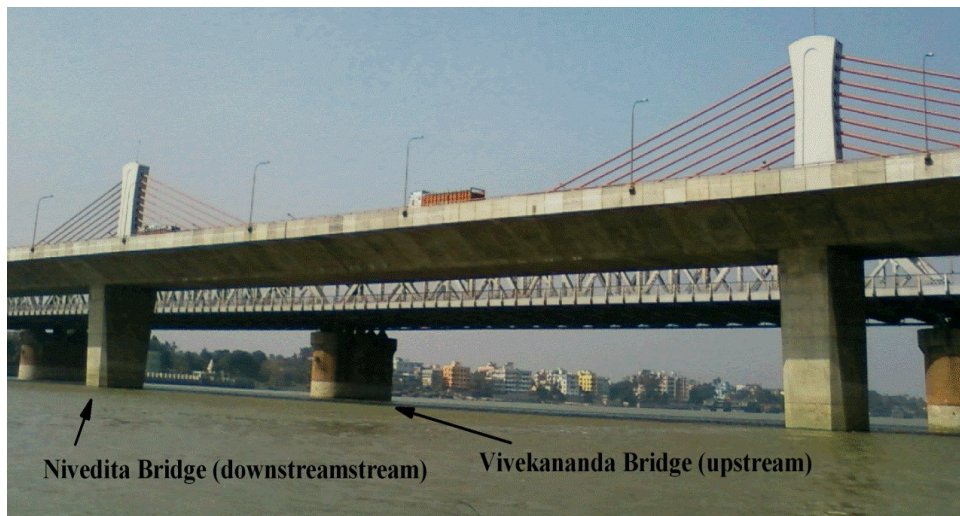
Pier groups of Nivedita Bridge (new) and Vivekananda Bridge (old) in India.
